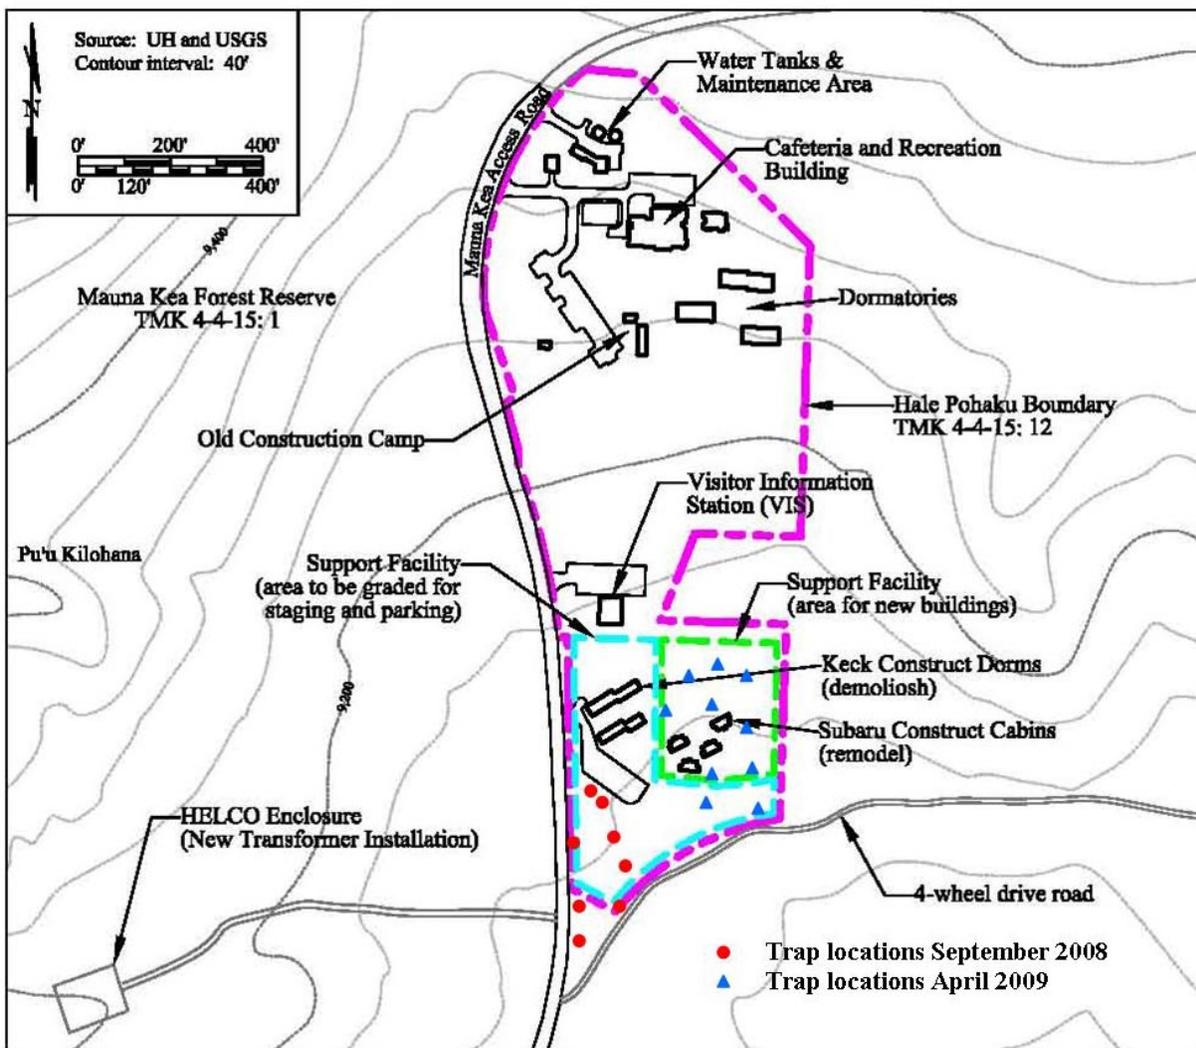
Pitfall Live-Traps sites at the TMT Mid-Level Support Facility.
